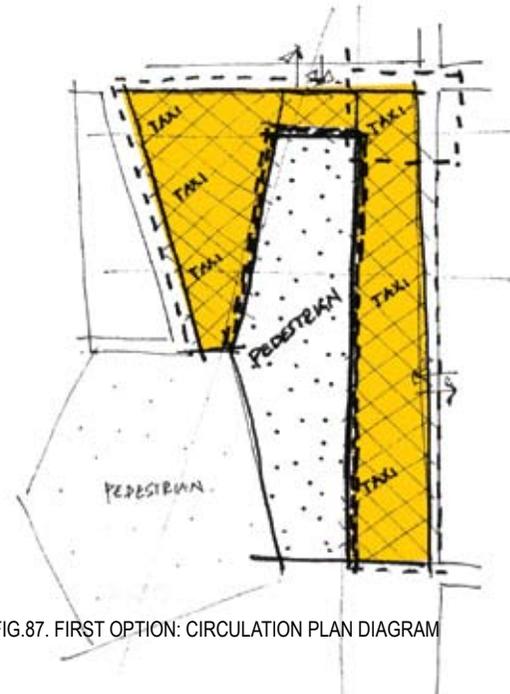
FIRST OPTION: CIRCULATION PLAN DIAGRAM
